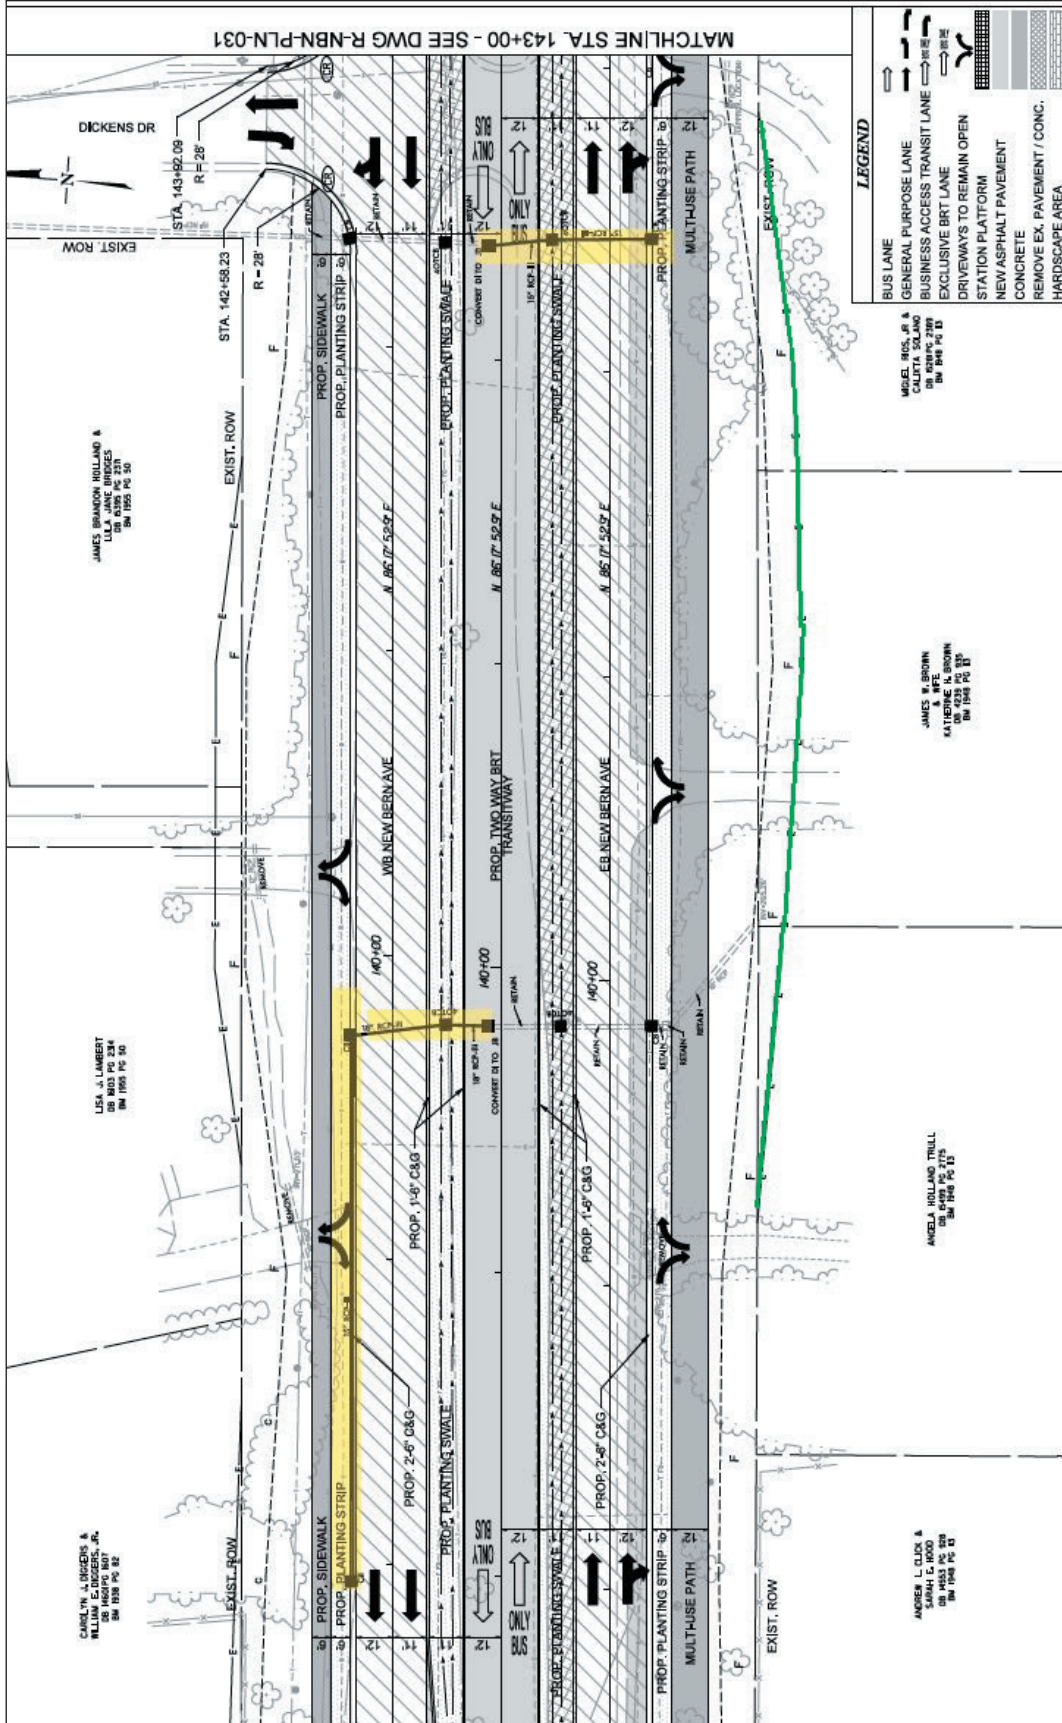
Temporary Construction Easements Shown in Green, Wake BRT New Bern Corridor Preliminary Plans, Sheet R-NBN-030, 2020
